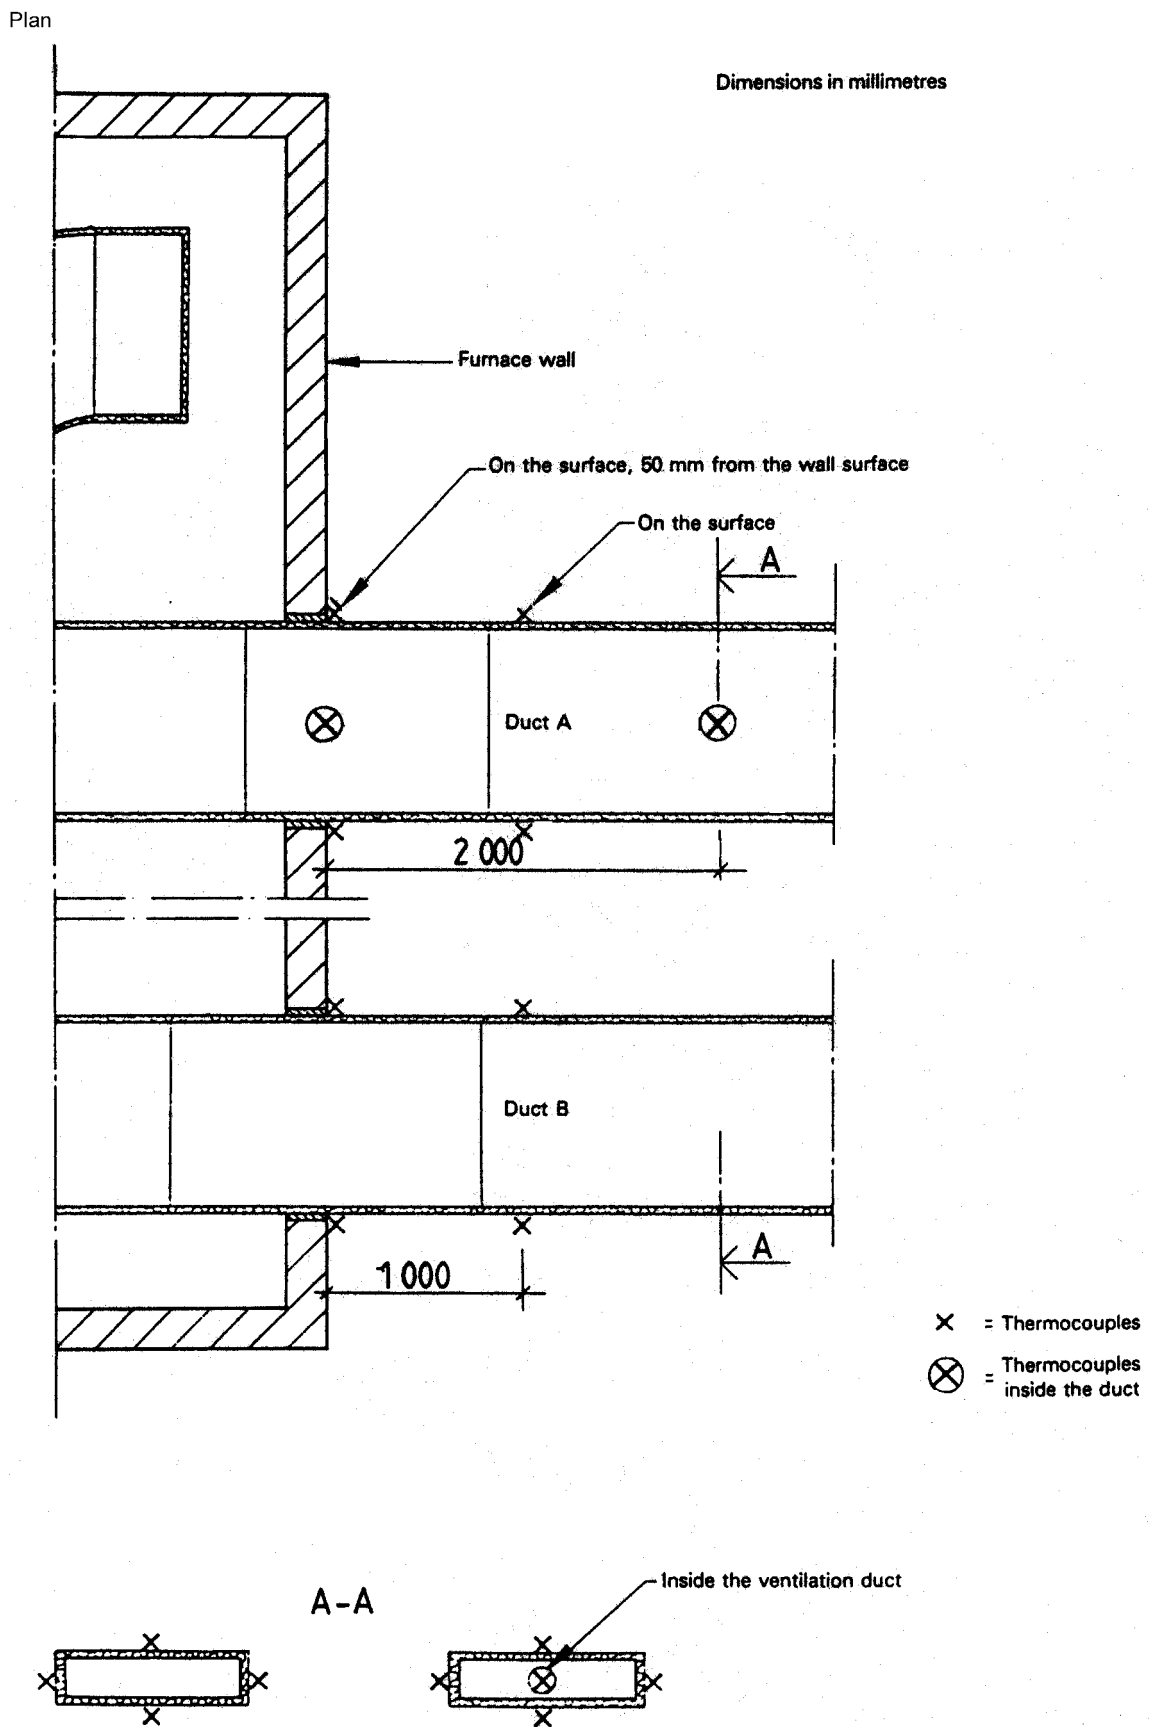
Location of thermocouples on horizontal ducts outside the furnace - typical test arrangement to BS 476: Part 24: 1987
